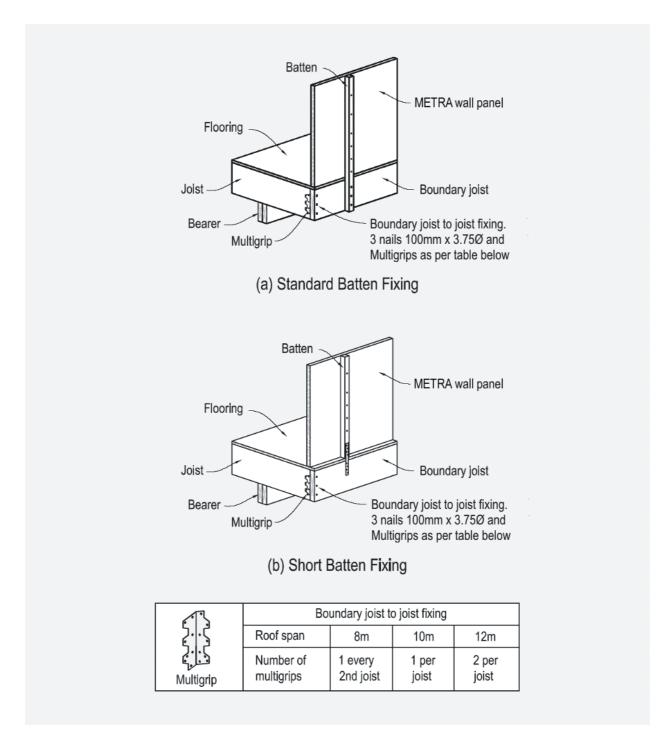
Cantilever Boundary Joist Fixings – Heavy Roof
